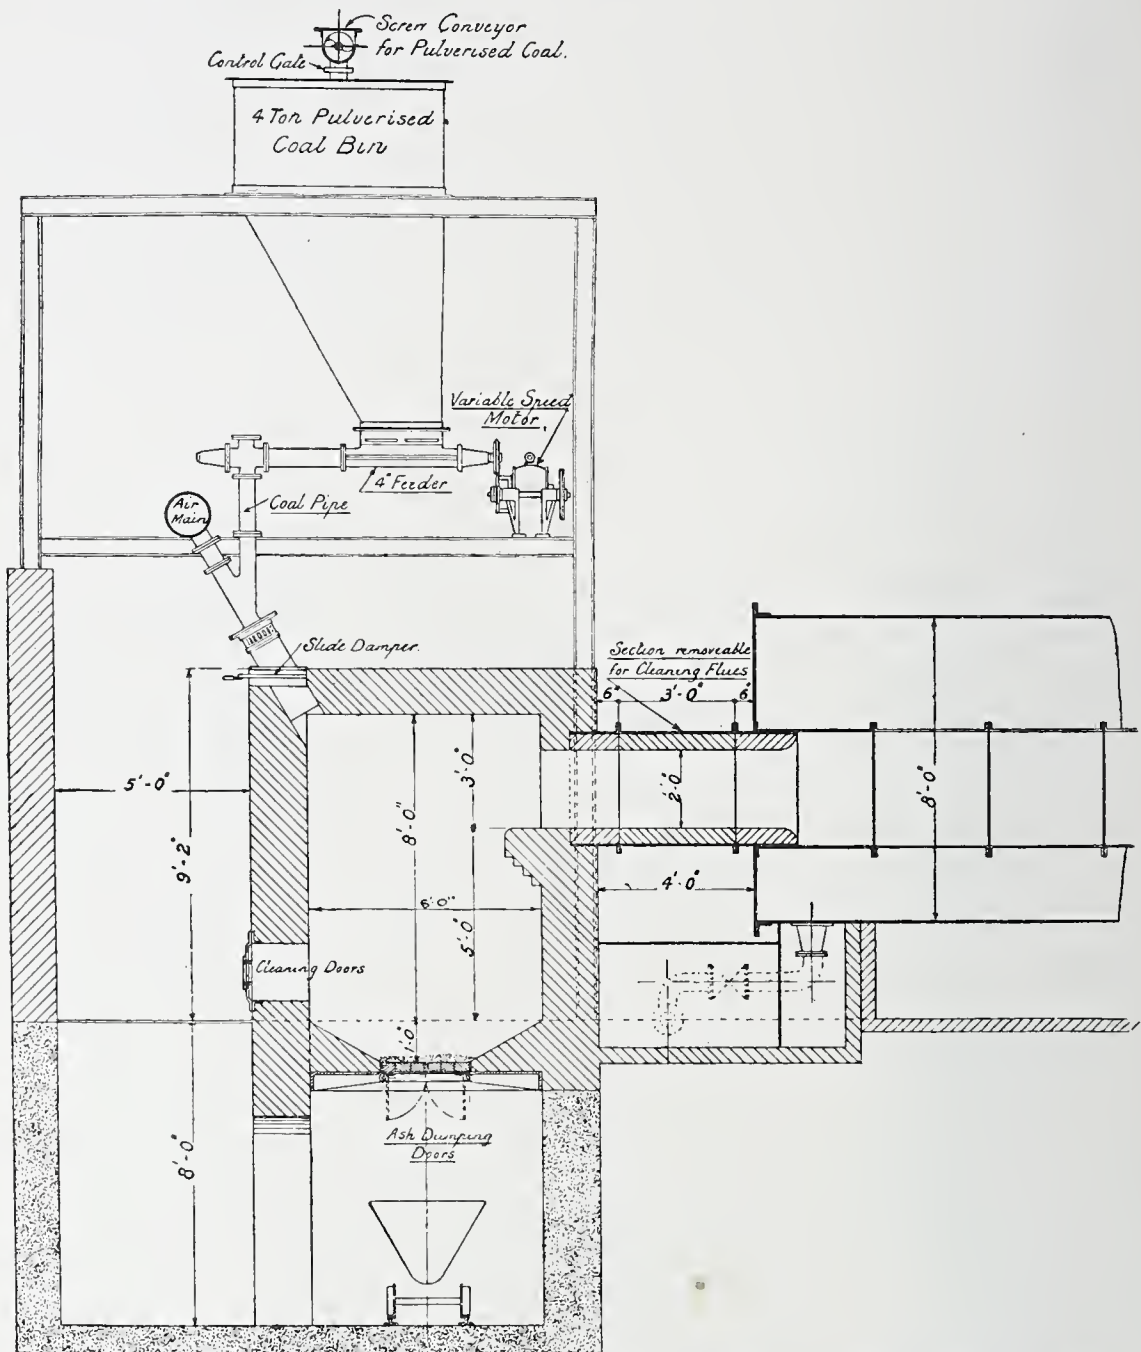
Pulverised Coal Fired Internal Fire Tube (Lancashire) Boiler, showing External Combustion Chamber.
